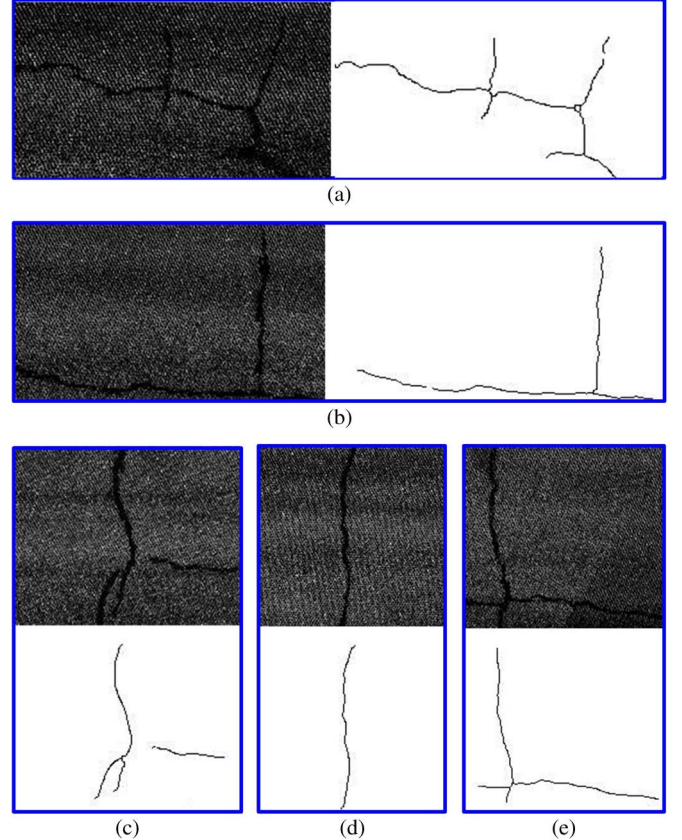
GRF images and extracted cracks. (a) Crack 1. (b) Crack 2. (c) Crack 3. (d) Crack 4. (e) Crack 5.
